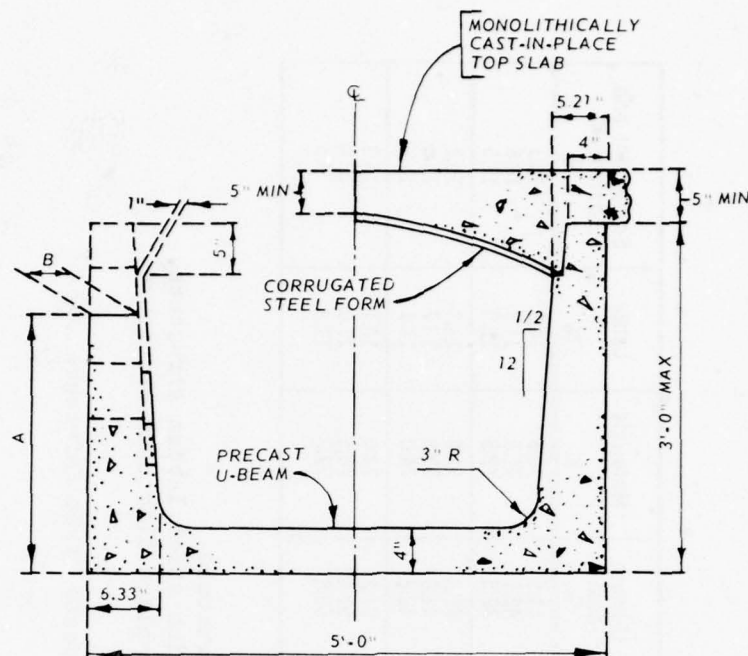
Typical cross section of the composite U-beam bridge deck (from Reference 10)
